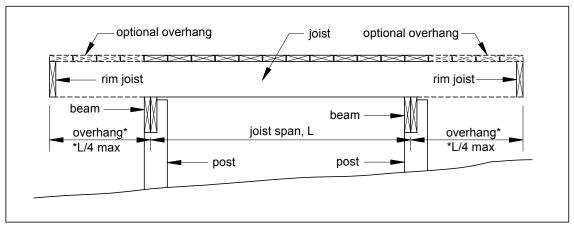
JOIST SPAN - FREE STANDING DECK
